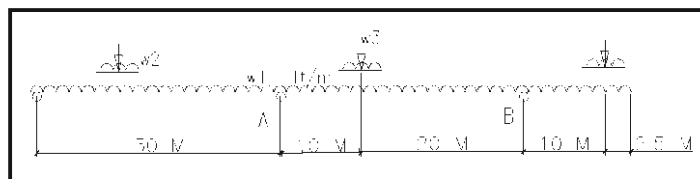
Loading diagram when cantilever end is 12.5 m to the right of support B (Case 5.1.2)
